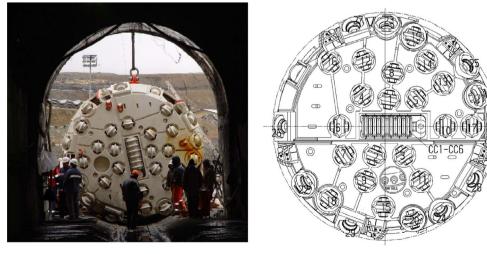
A View of machine cutterhead and disk cutters arrangement on the cutterhead.
